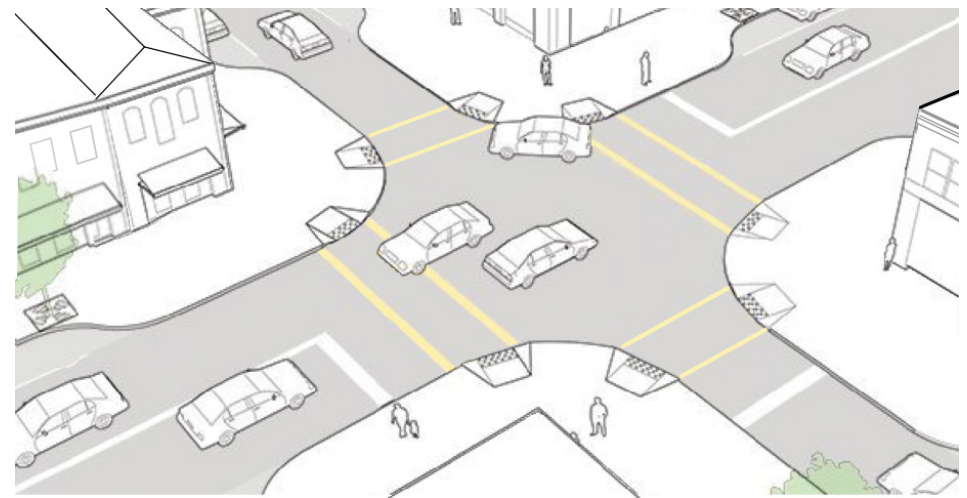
Preferred Approach (Image adapted from NACTO Urban Street Design Guide)
